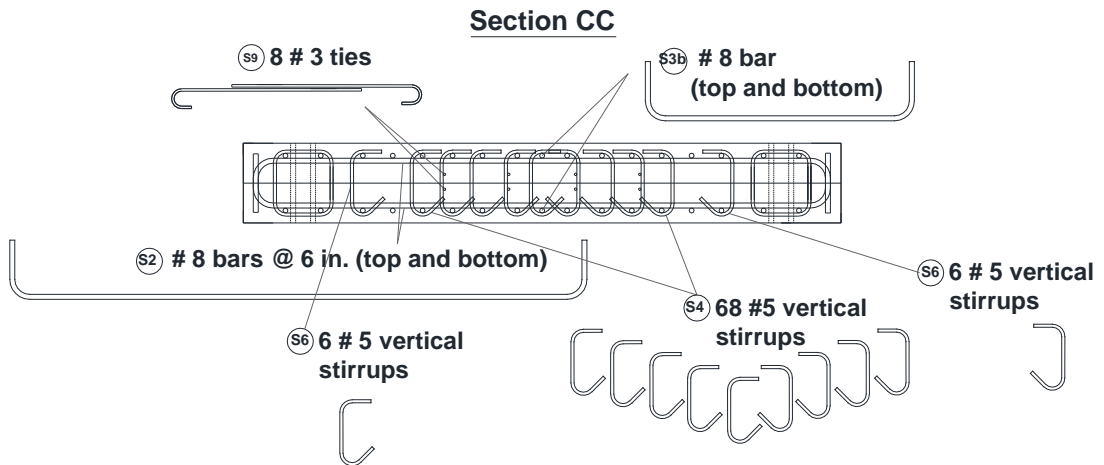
Elevation view of slab reinforcement at Section CC for Specimen #1
